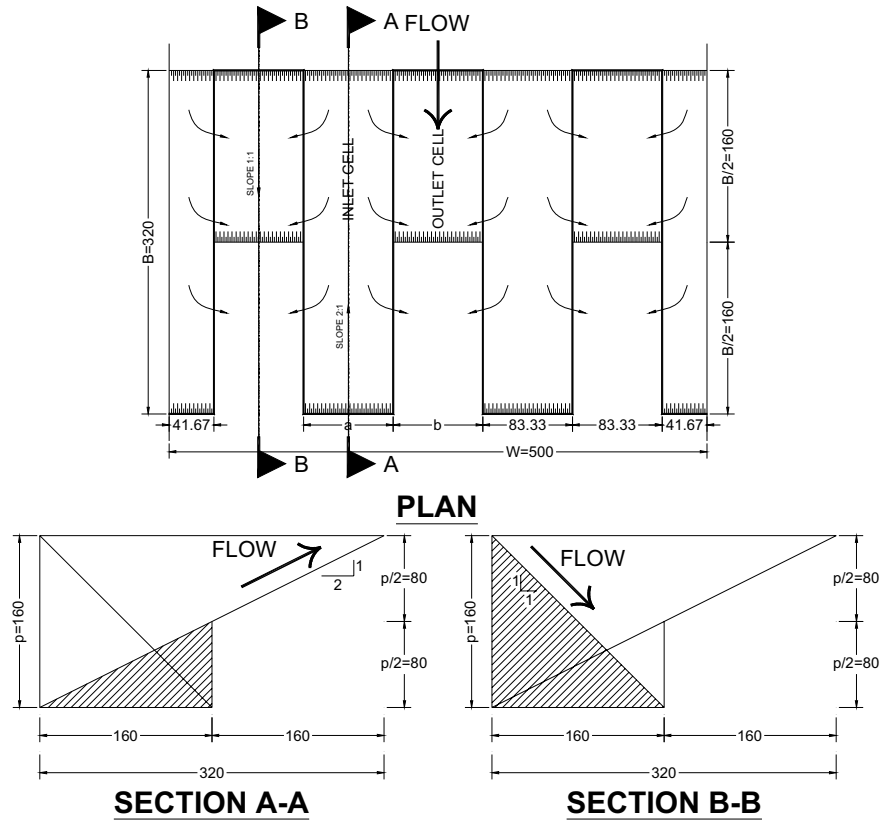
Plan and section of model P_4M_3 (both sides ramping), (dimensions in mm)
